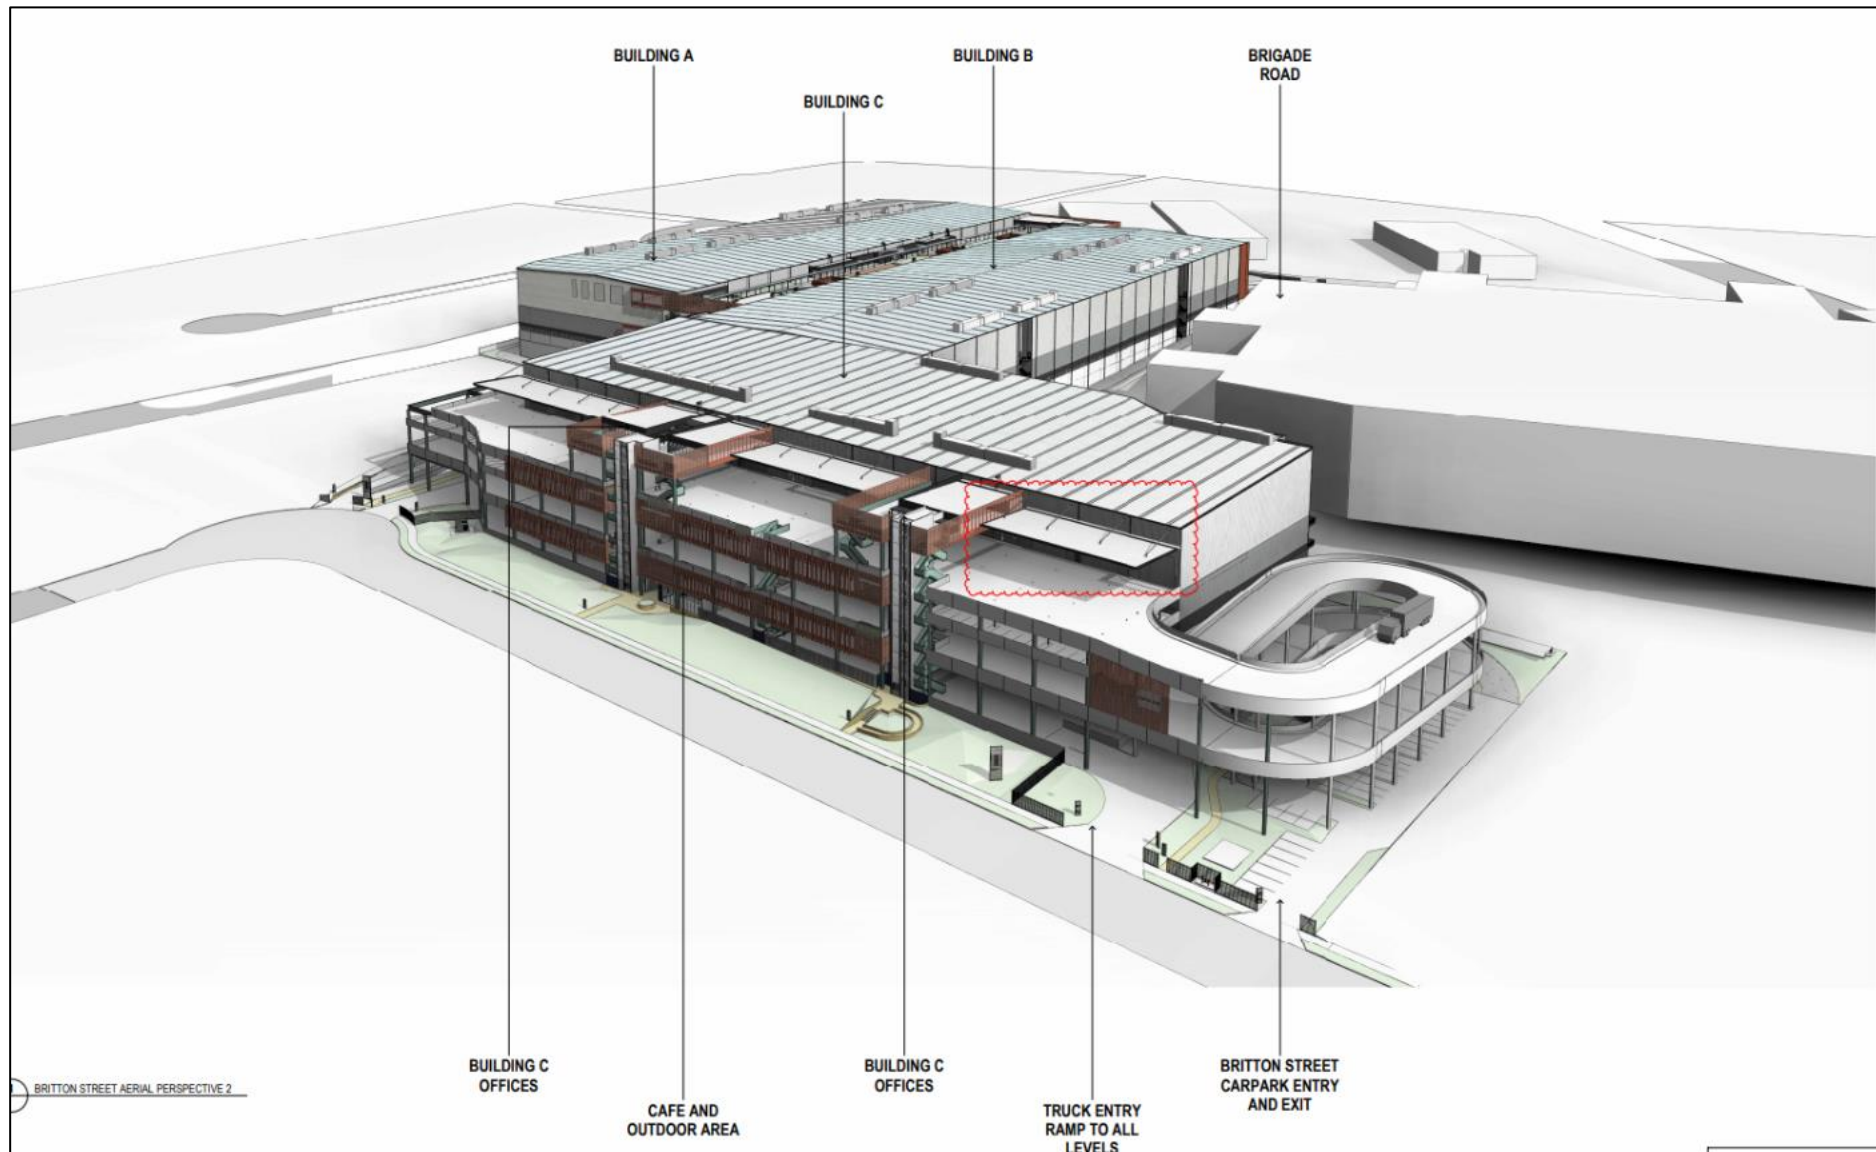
Britton Street Aerial Perspective (Source: SBA Architects, 2024)
